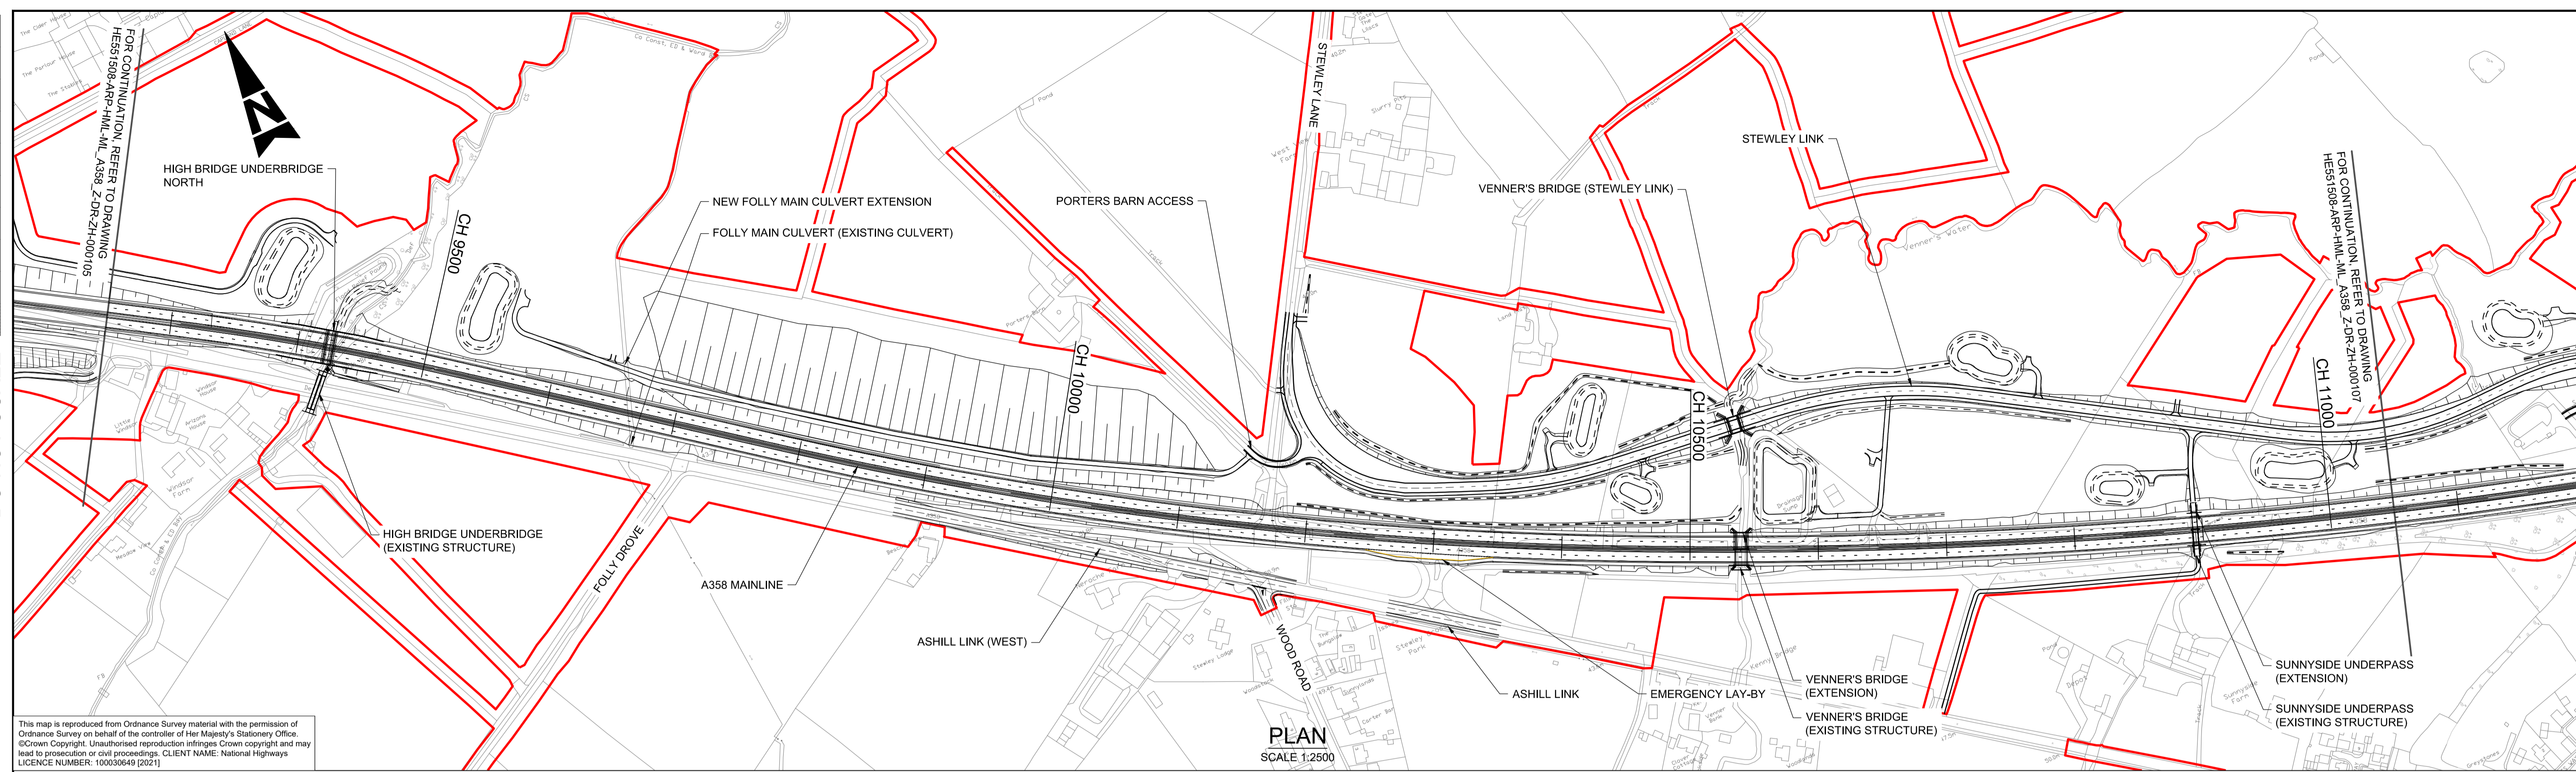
PLAN AND PROFILE - SHEET 4 SECTION 2/3 MATTOCK'S TREE GREEN JUNCTION TO BICKENHALL LANE
